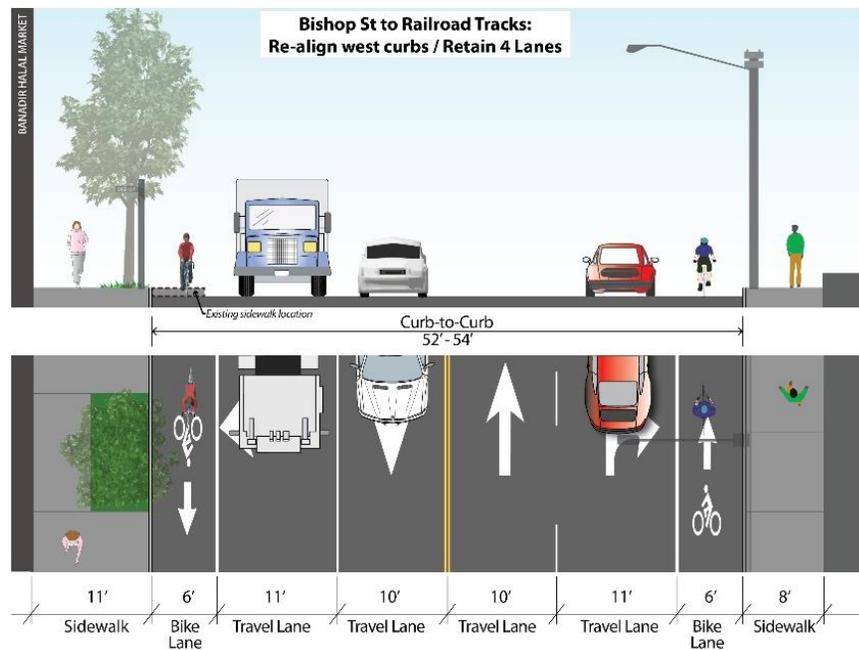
Preferred Alternative — Forest Avenue from Bishop Street to Railroad Tracks
